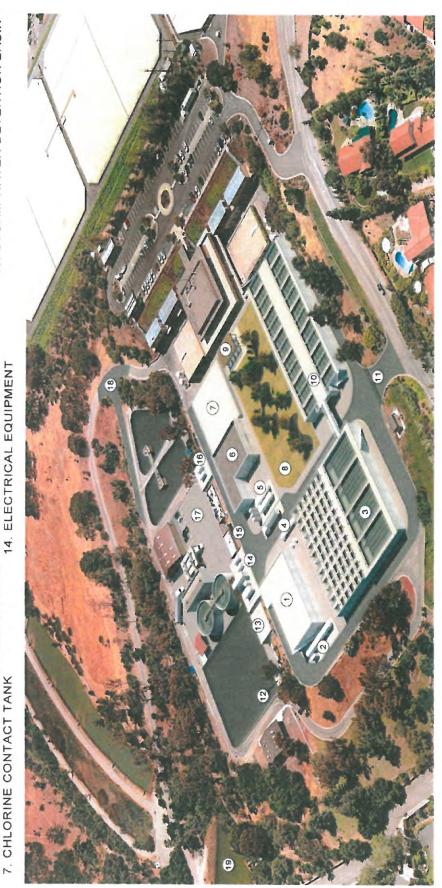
Graphic Rendering of Proposed Facilities to be constructed in Reliability Improvement Project at Rinconada Water Treatment Plant
